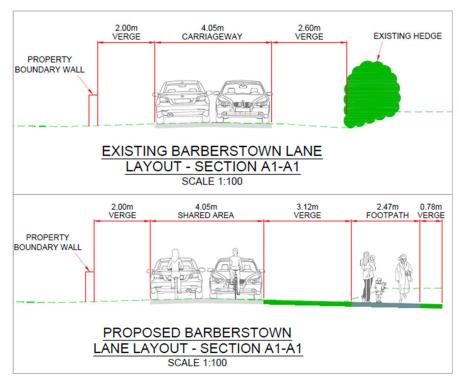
Existing and Proposed Cross Section Barberstown Lane North Access Road
